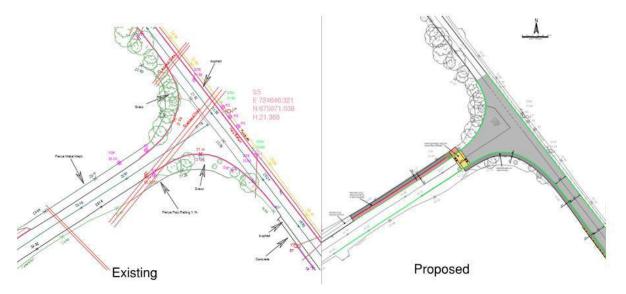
Existing and proposed Beech Road Junction upgrade works.
